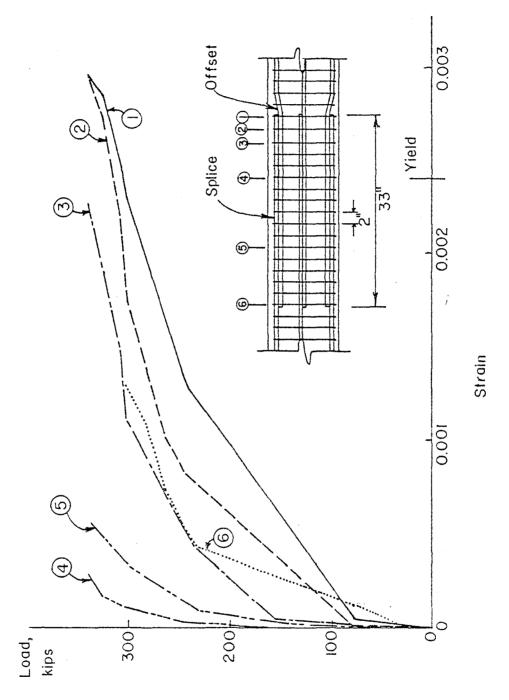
Tensile Strains in Transverse Reinforcement in Specimen S6-2
